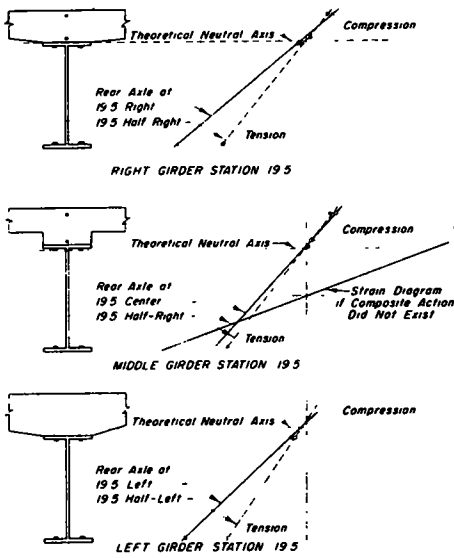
Representative cross sections of strain, indicating full composite action in all girders at midspan of suspended span.
